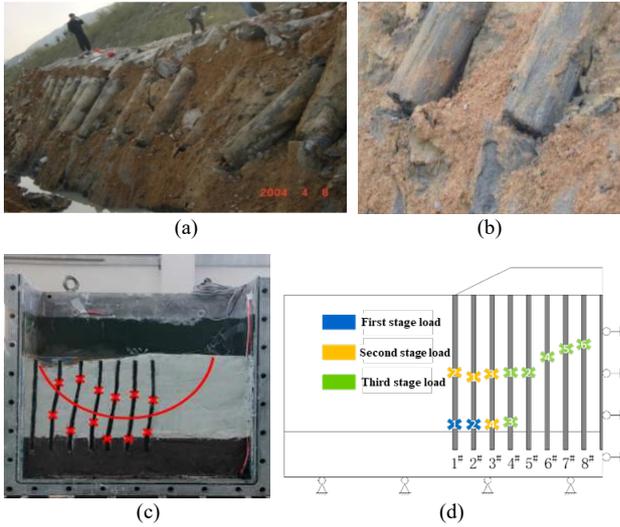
Progressive failure of rigid column (a) and (b) photos of the excavated columns, (c) failure points of the column after centrifuge test (d) failure points of the column after numerical simulations.
